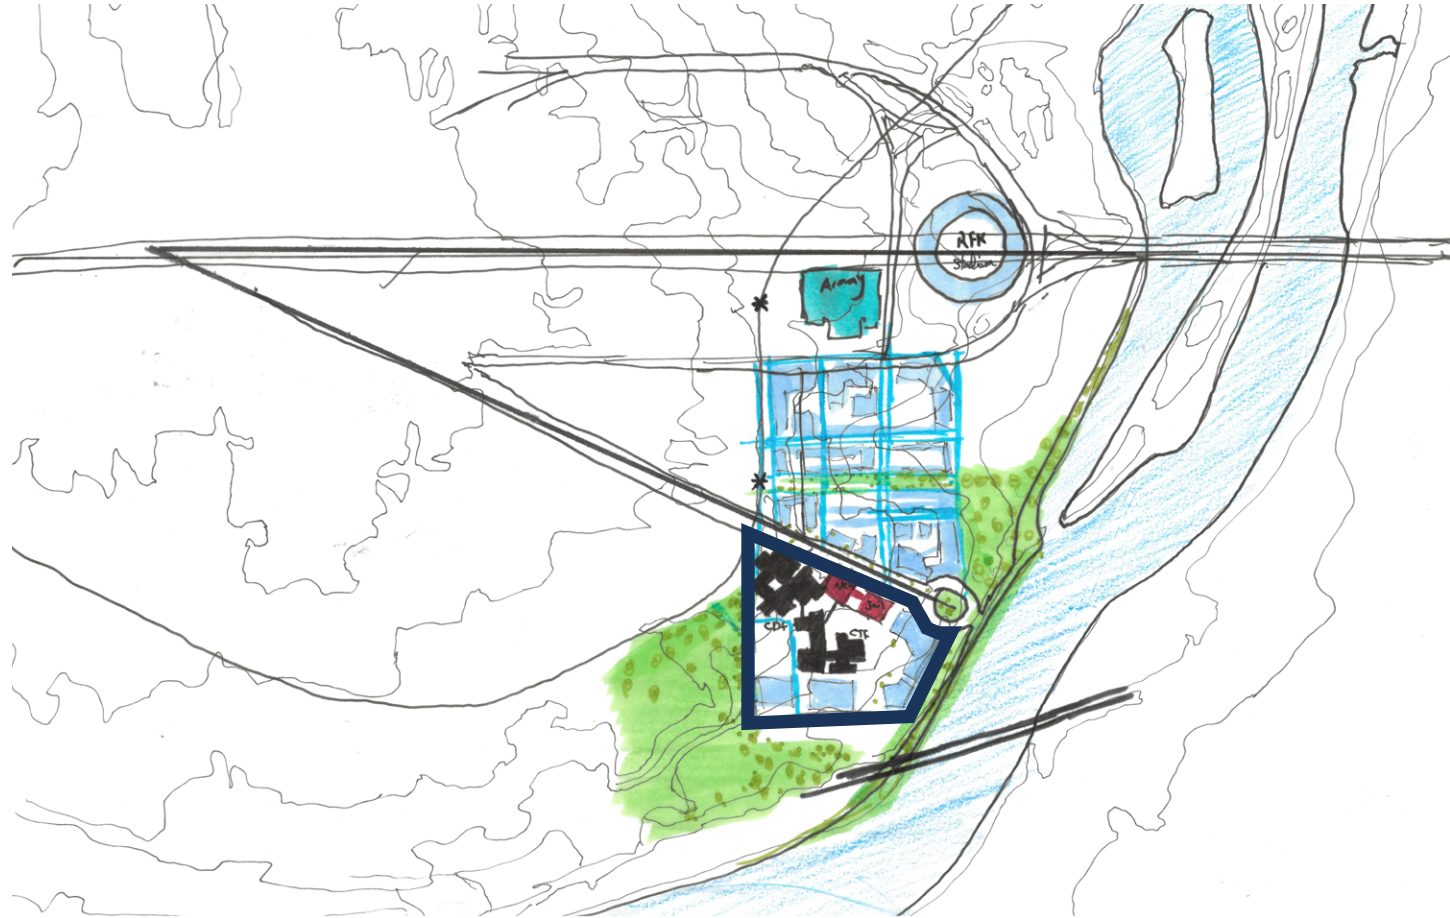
Diagram of the Hill East Master Plan highlighting important building facades (by author).
